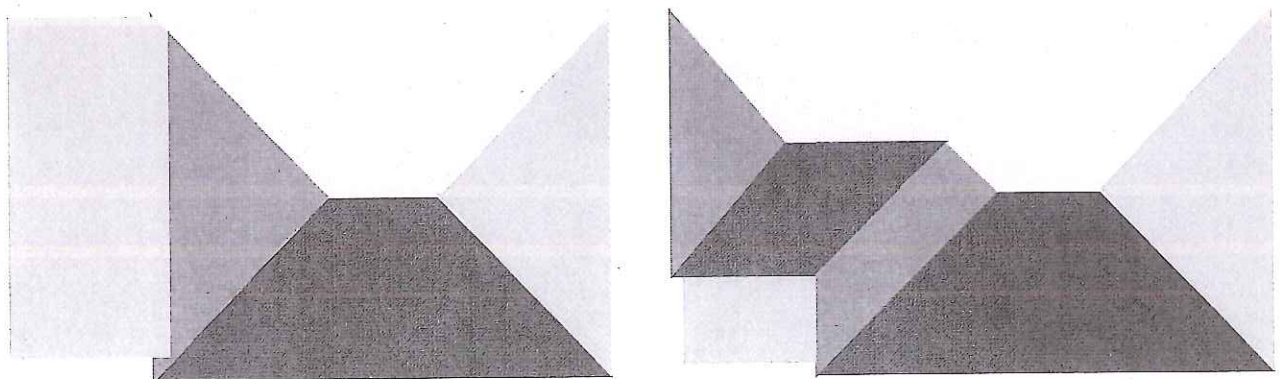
Roof plans amended to reflect Condition 1(i), either as a skillion over the garage/laundry, or a secondary hip.
